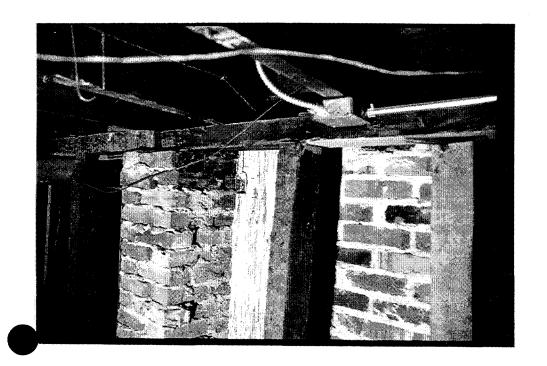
FIRST FLOOR JOISTS AT THE WEST SILL BEAM
